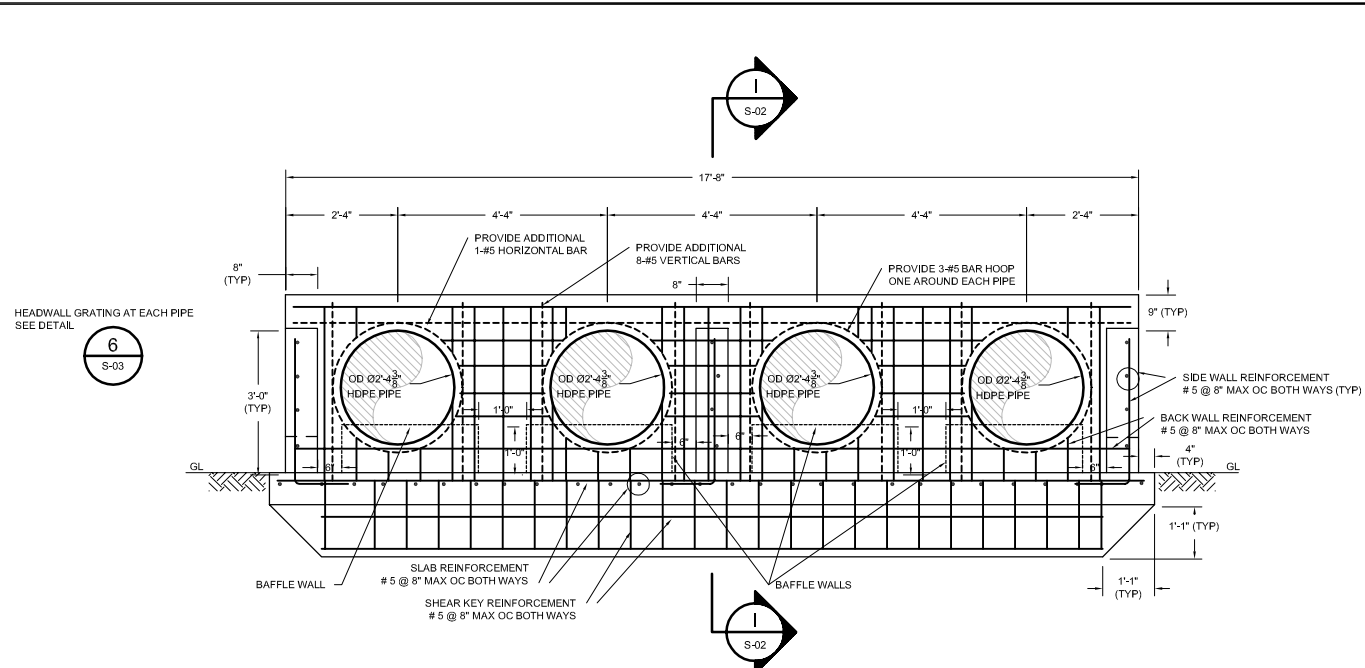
AOI4 AREA CONCRETE HEADWALL
